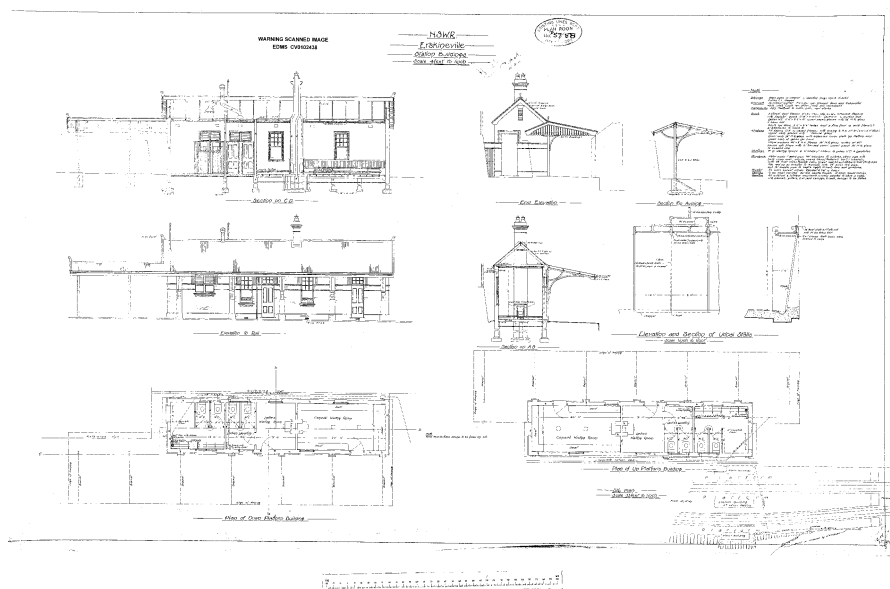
1911 plans for Erskineville Station side platform buildings
